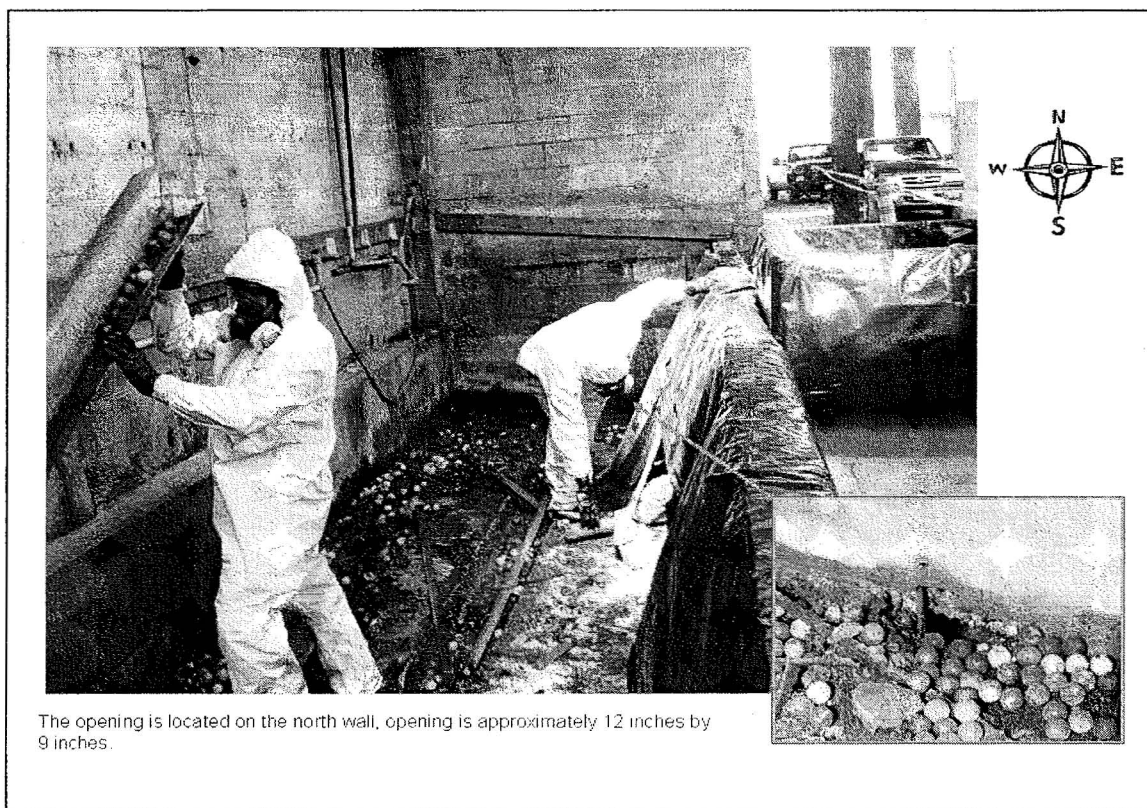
Tank containment area during cleanup. Inset shows hole discovered in northern wall.
